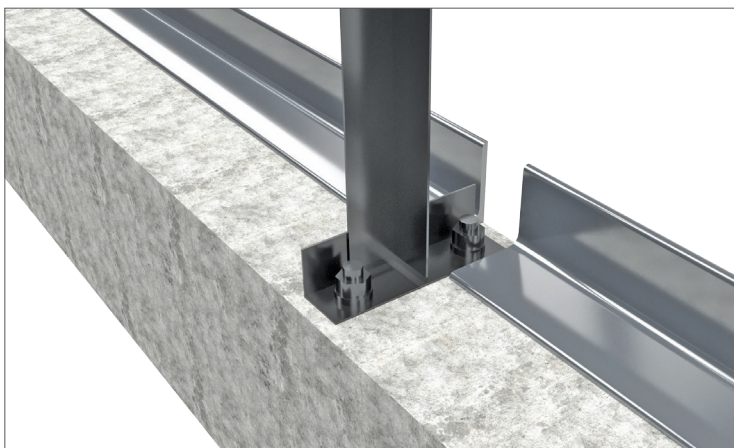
Bracing of side rails for heavy cladding resting on a foundation or on brickwork
